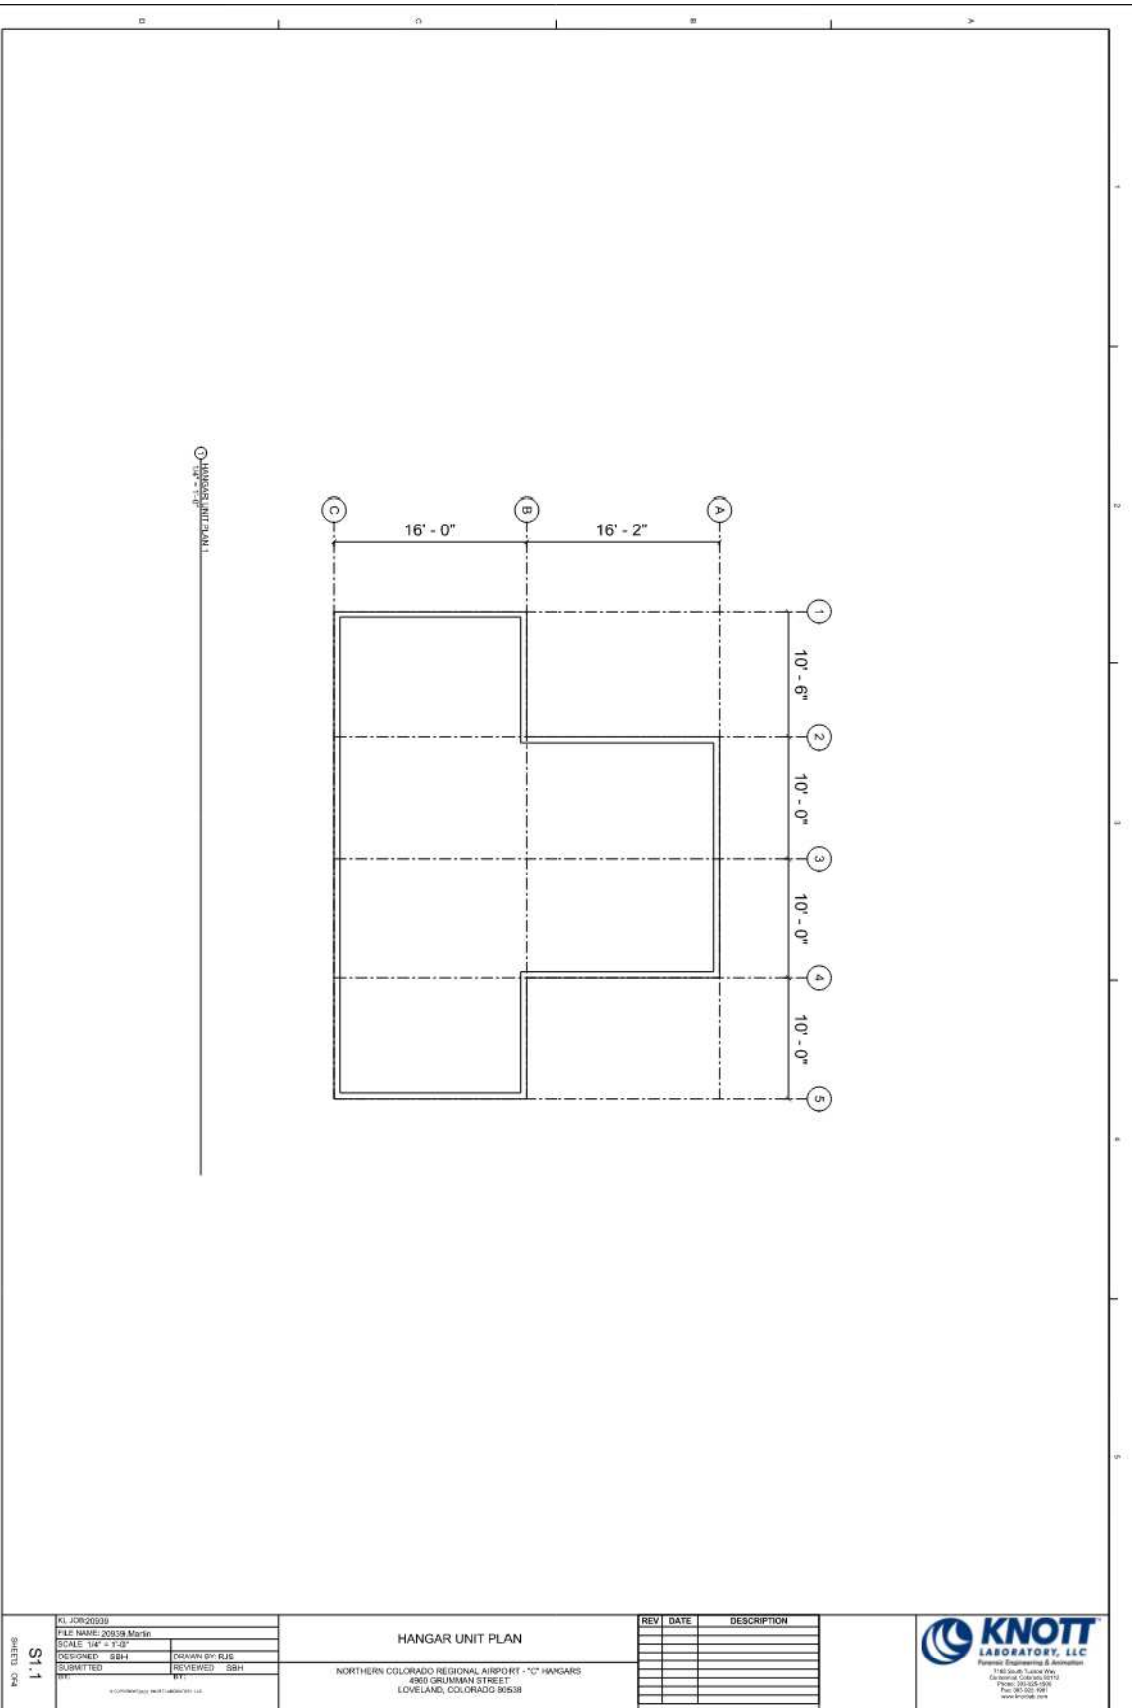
Exemplar plan of "T" shaped individual hangar units.
